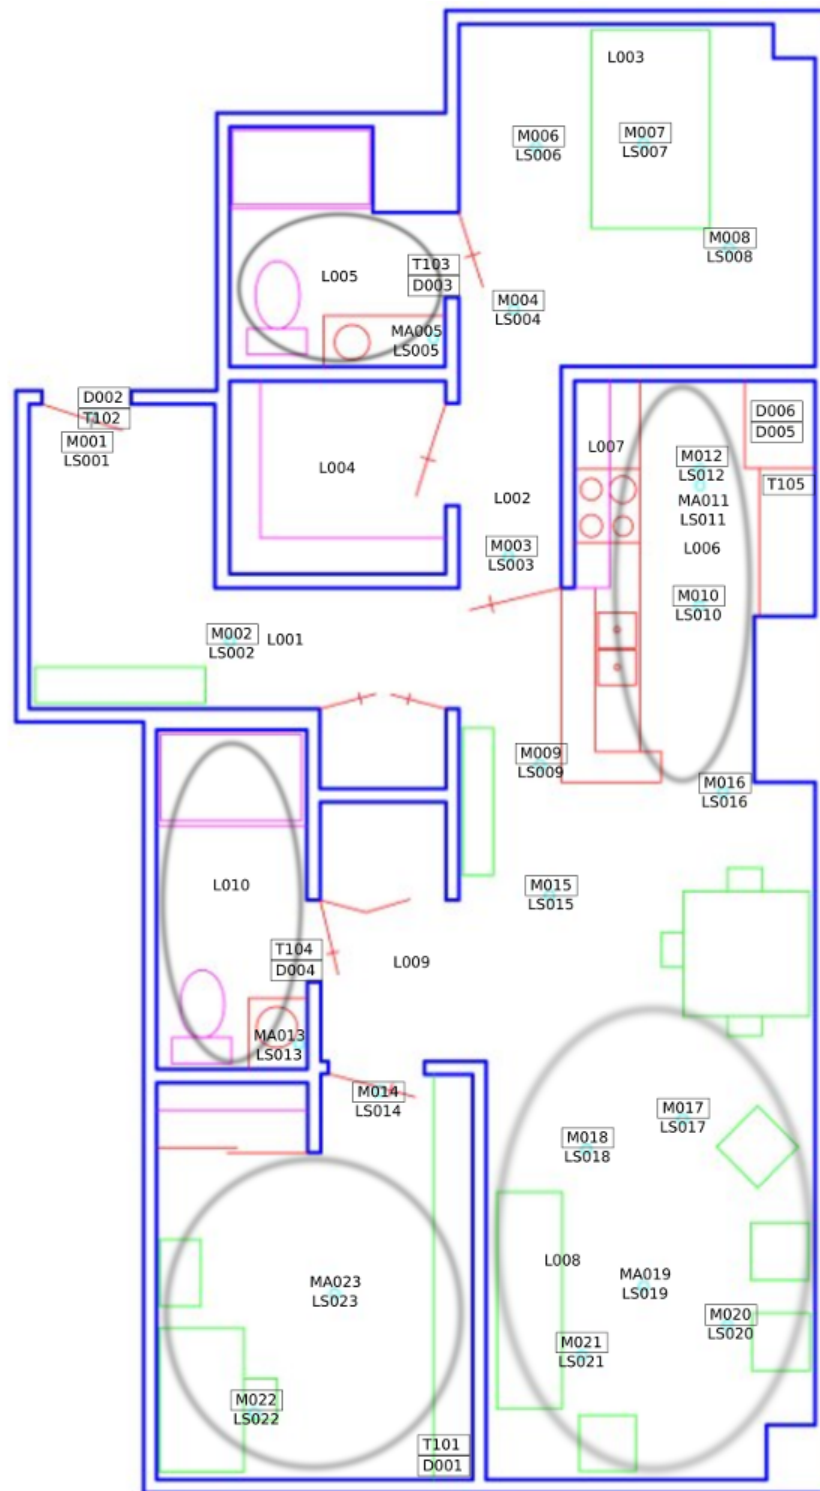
Floor plan and sensor placement for the testbed hh113.
